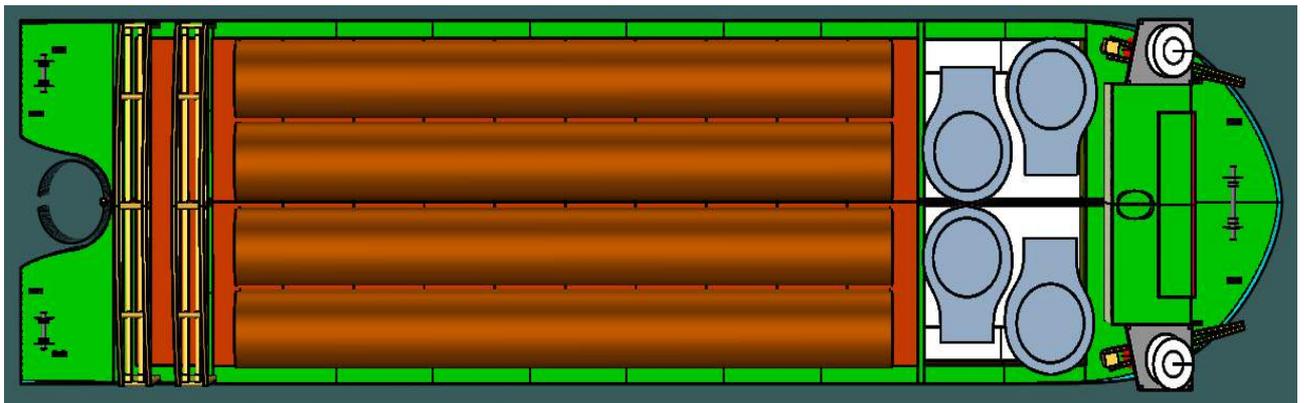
Top View of Load out of TP and Monopile (Second Arrangement)
